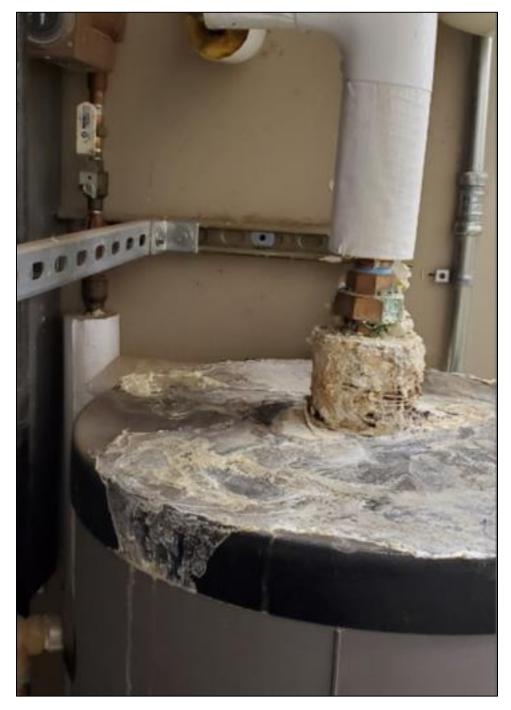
Emergency Services Building - Sediment Buildup on Water Heater
